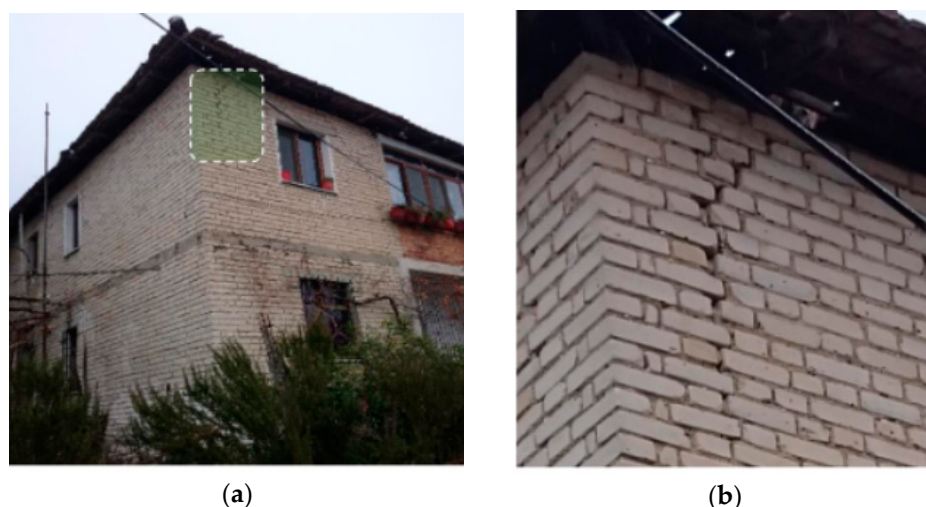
Vertical cracks on corners of the building indicates the lack of rigid diaphragm action of the roof and floor systems. (a) Loosely connected walls; (b) Absence of a sturdy toop roof or lack of RC ring beam.
